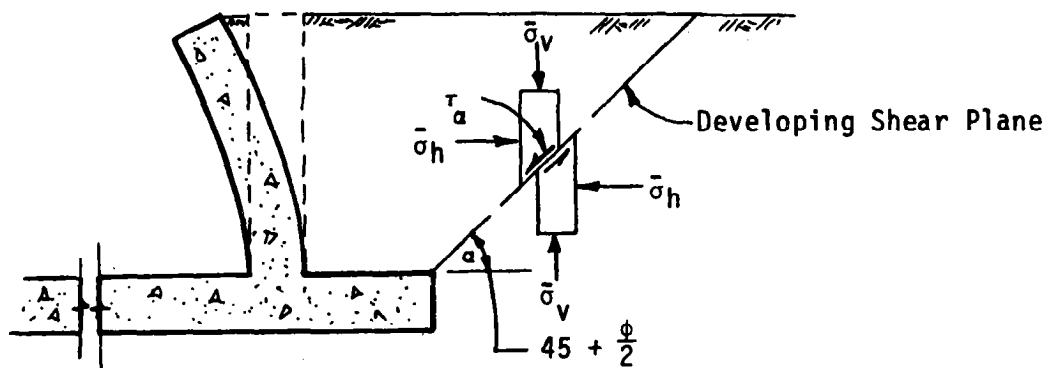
FAILING BACKFILL BEHIND OUTWARD YIELDING WALL
